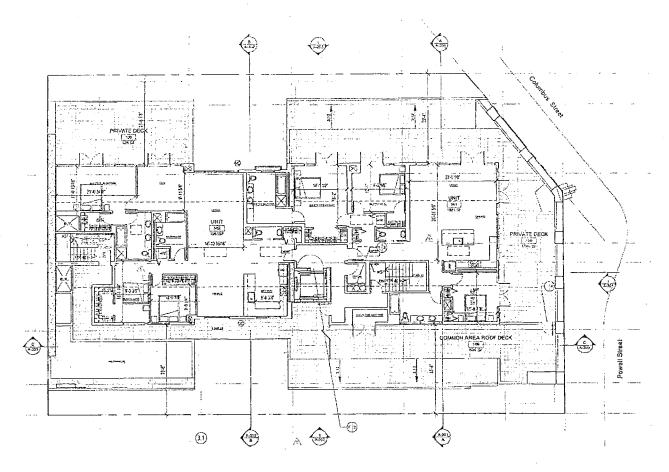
PROPOSED 1731 POWELL ST FIFTH LEVEL PLAN Source: SWS 1/7/13
